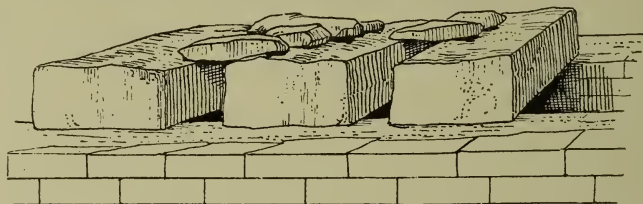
USE (APPARENT) OF STONE FOR BRIDGING SPACES BETWEEN CEILING STONES.
